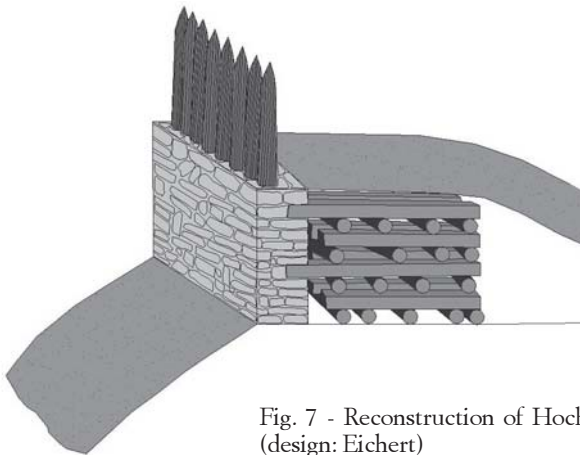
Reconstruction of Hochgosch's wall-construction (design: Eichert)
